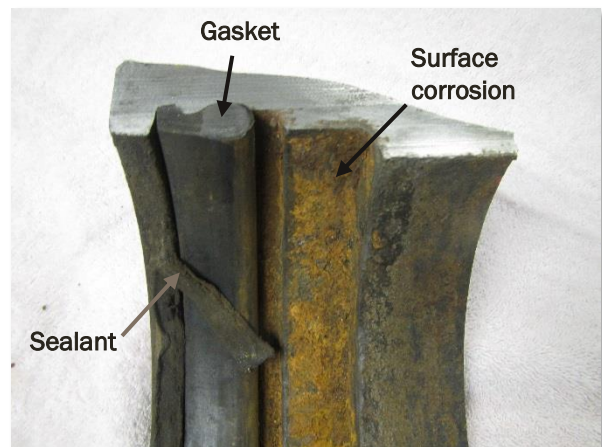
Surface corrosion inside joint; rubber gasket in good condition; additional sealant.
